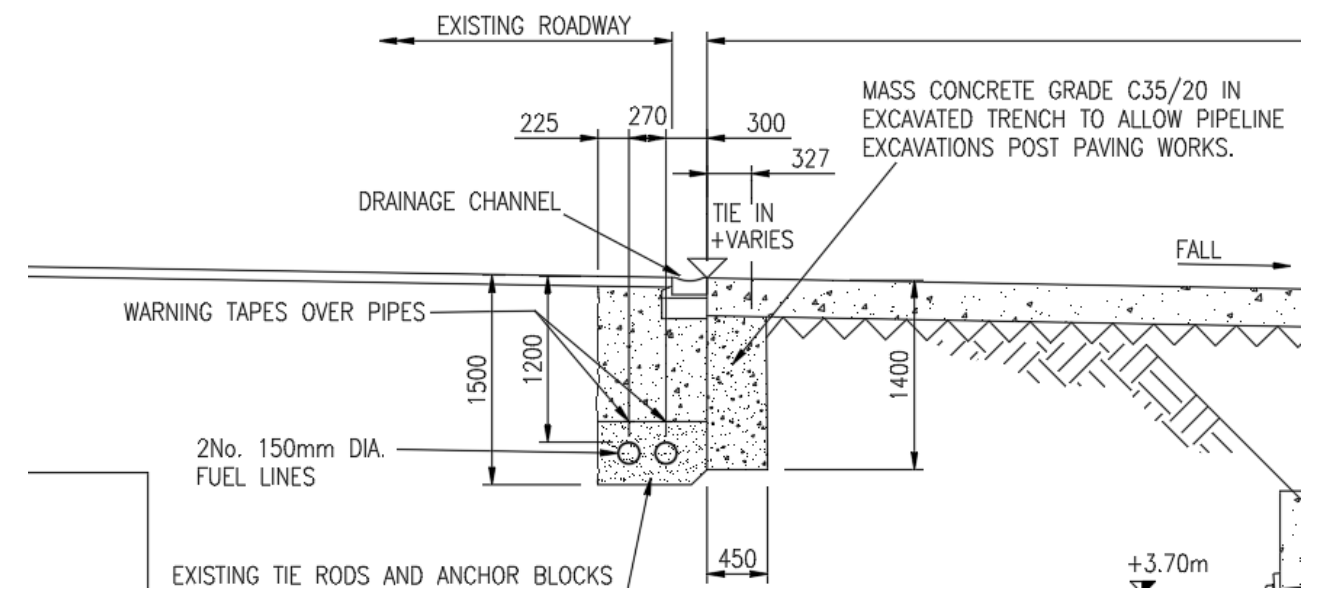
16 Example of 150mm diameter fuel lines positioned along the southern edge of the Albert Quay deck slab, with 1.2m of cover above the pipes. The drawing shows sand surrounding the pipes and an adjacent buried mass concrete wall. The mass concrete wall has been constructed to act as a temporary retaining wall during excavations of the fuel lines. The backfill above the sand surround appears to be mass concrete, although it has not been annotated in the drawing.
